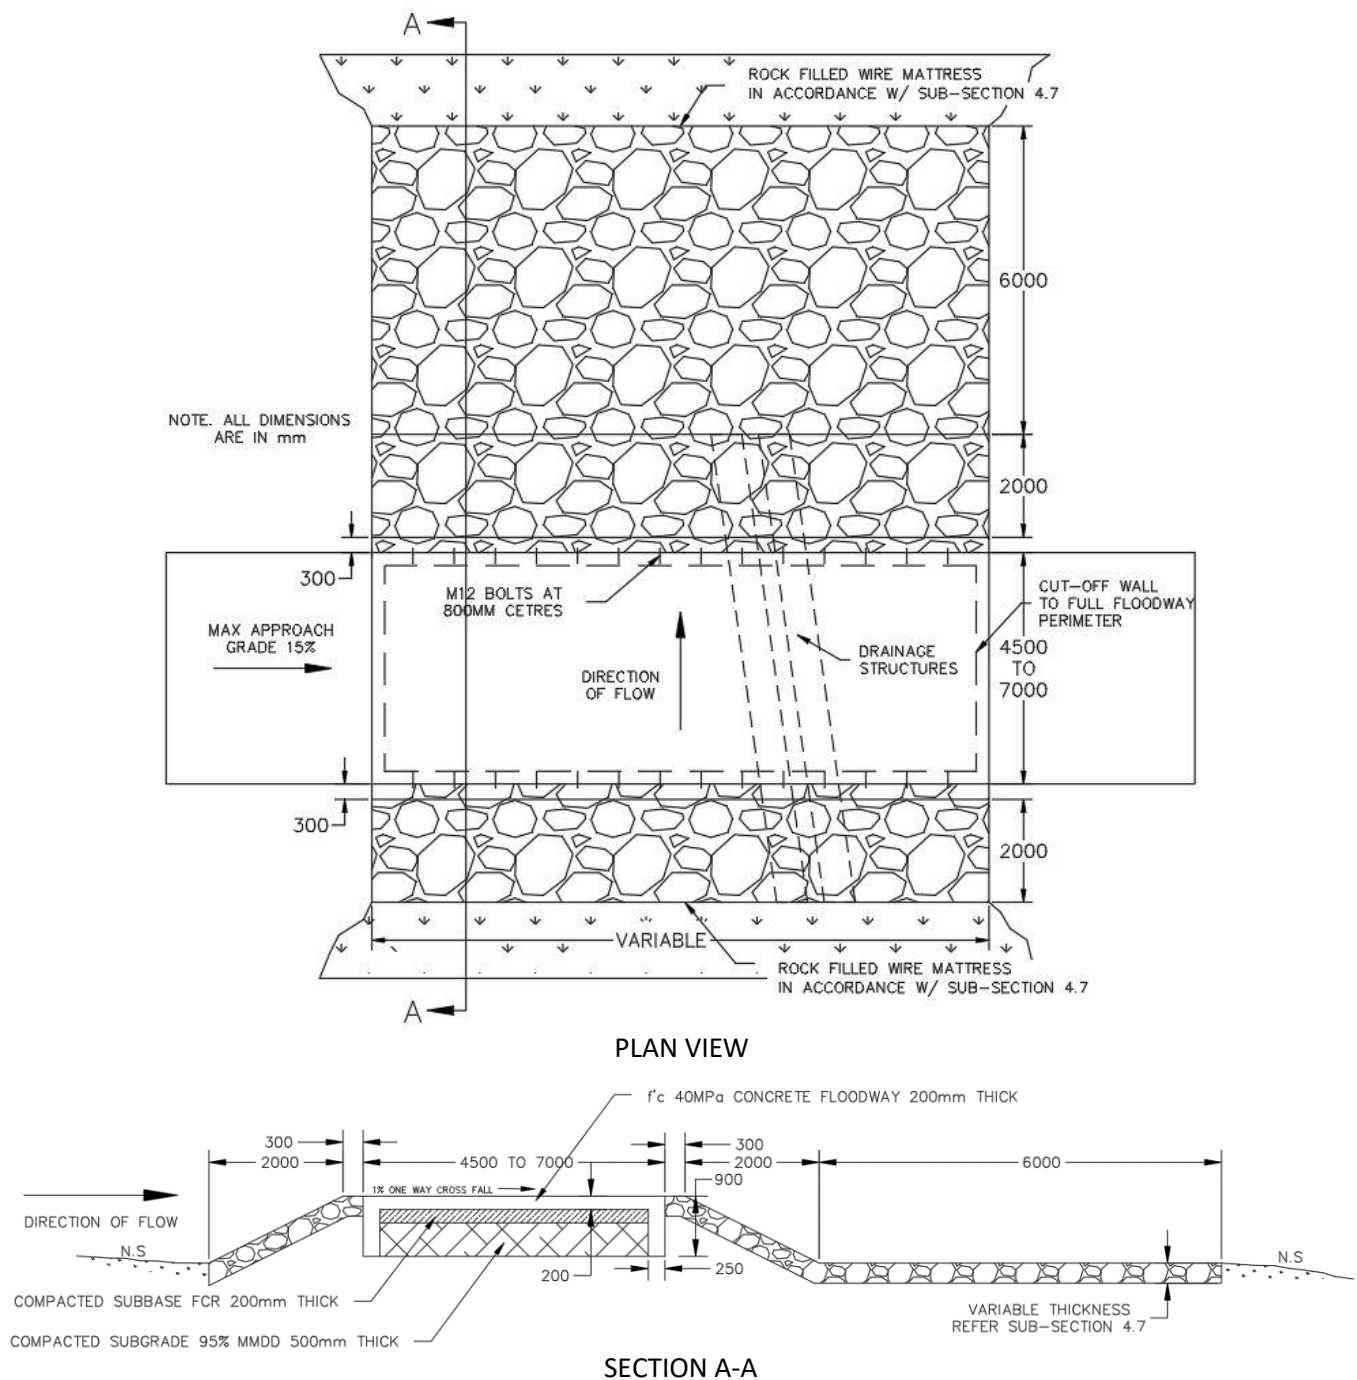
Floodway Type 3 details (LVRC 2008c).
